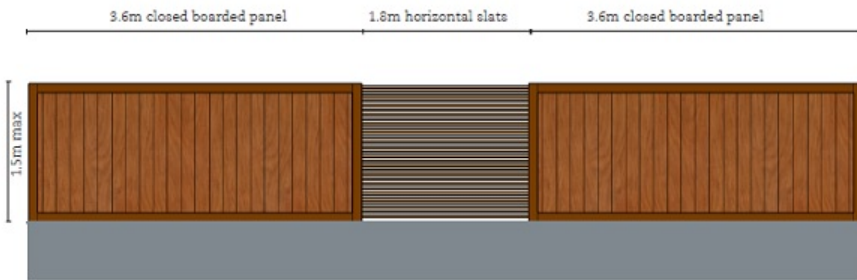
Fencing Detail 3 - Public Open Space - Conservation
